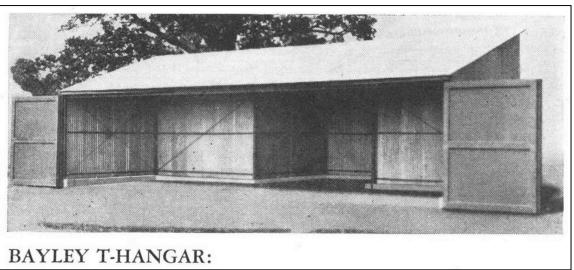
In 1945 the William Bayley Company of Springfield, Ohio offered an all-metal prefab T-hangar with jack-knife doors carried on overhead tracks. Wall were anchored to a cementblock foundation to reduce cost. A floor was optional. The back wall widths were identical, allowing multiple units to be nested back-to-back. This so-called nested T-hangar housed more planes in a wider but shorter footprint than a standard so-called stacked T-hangar, offering savings in materials and taxiway length (Source: Aviation News, December 24, 1945).
